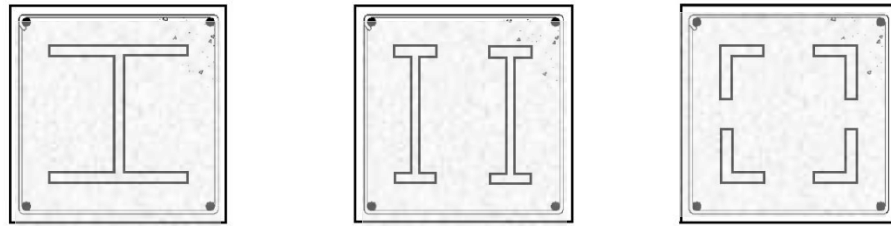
Steel-reinforcement concrete columns (Giakoumelis and Lam, 2004)
